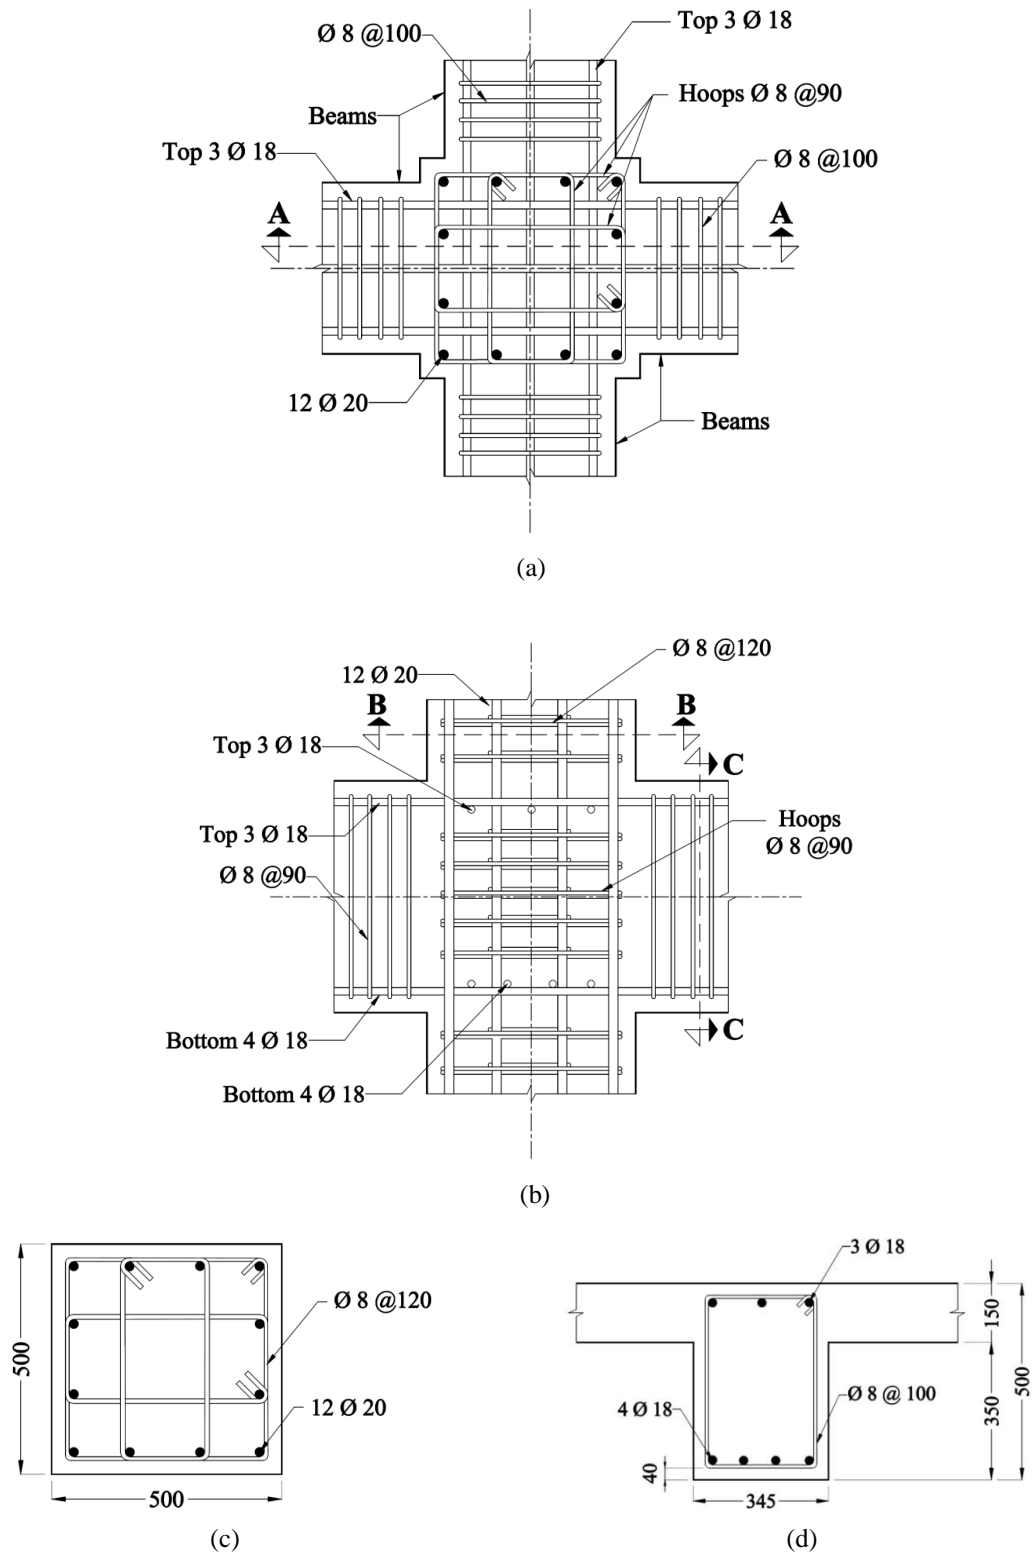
Cross-section details of the beam-column joint connection at the first floor of the Reference structure without eccentricity (a) top view, (b) elevation (section A-A), (c) section B-B in the column, and (d) section C-C in the beam (all dimensions are in millimetres).
